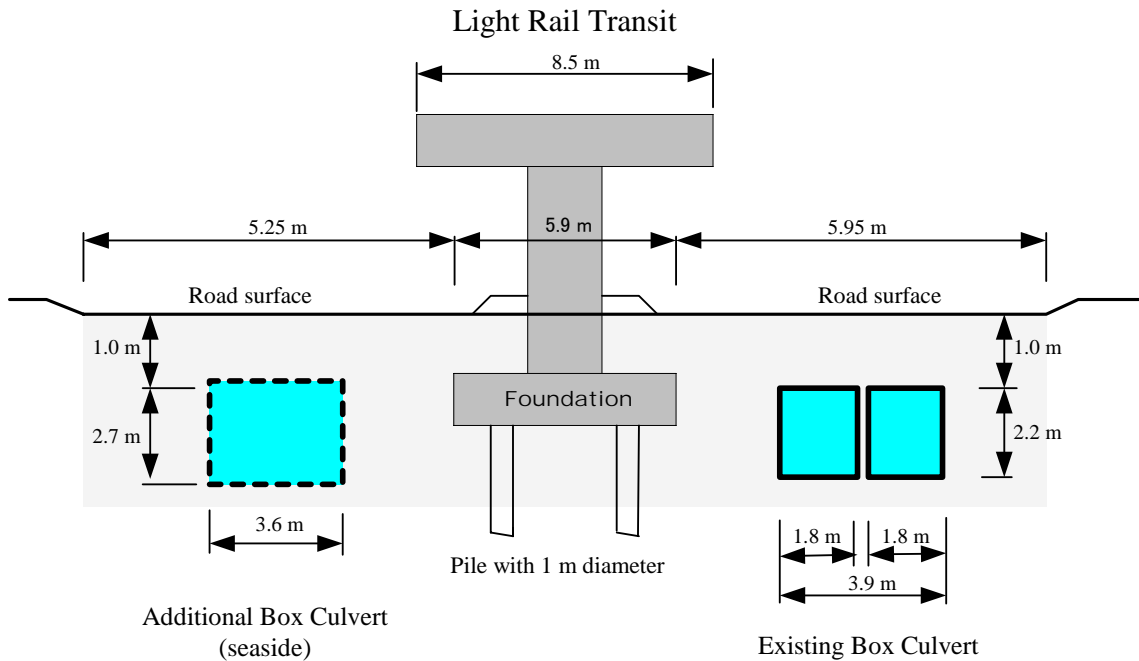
Additional Box Culvert of Blumentritt Interceptor (Rizal Avenue)
